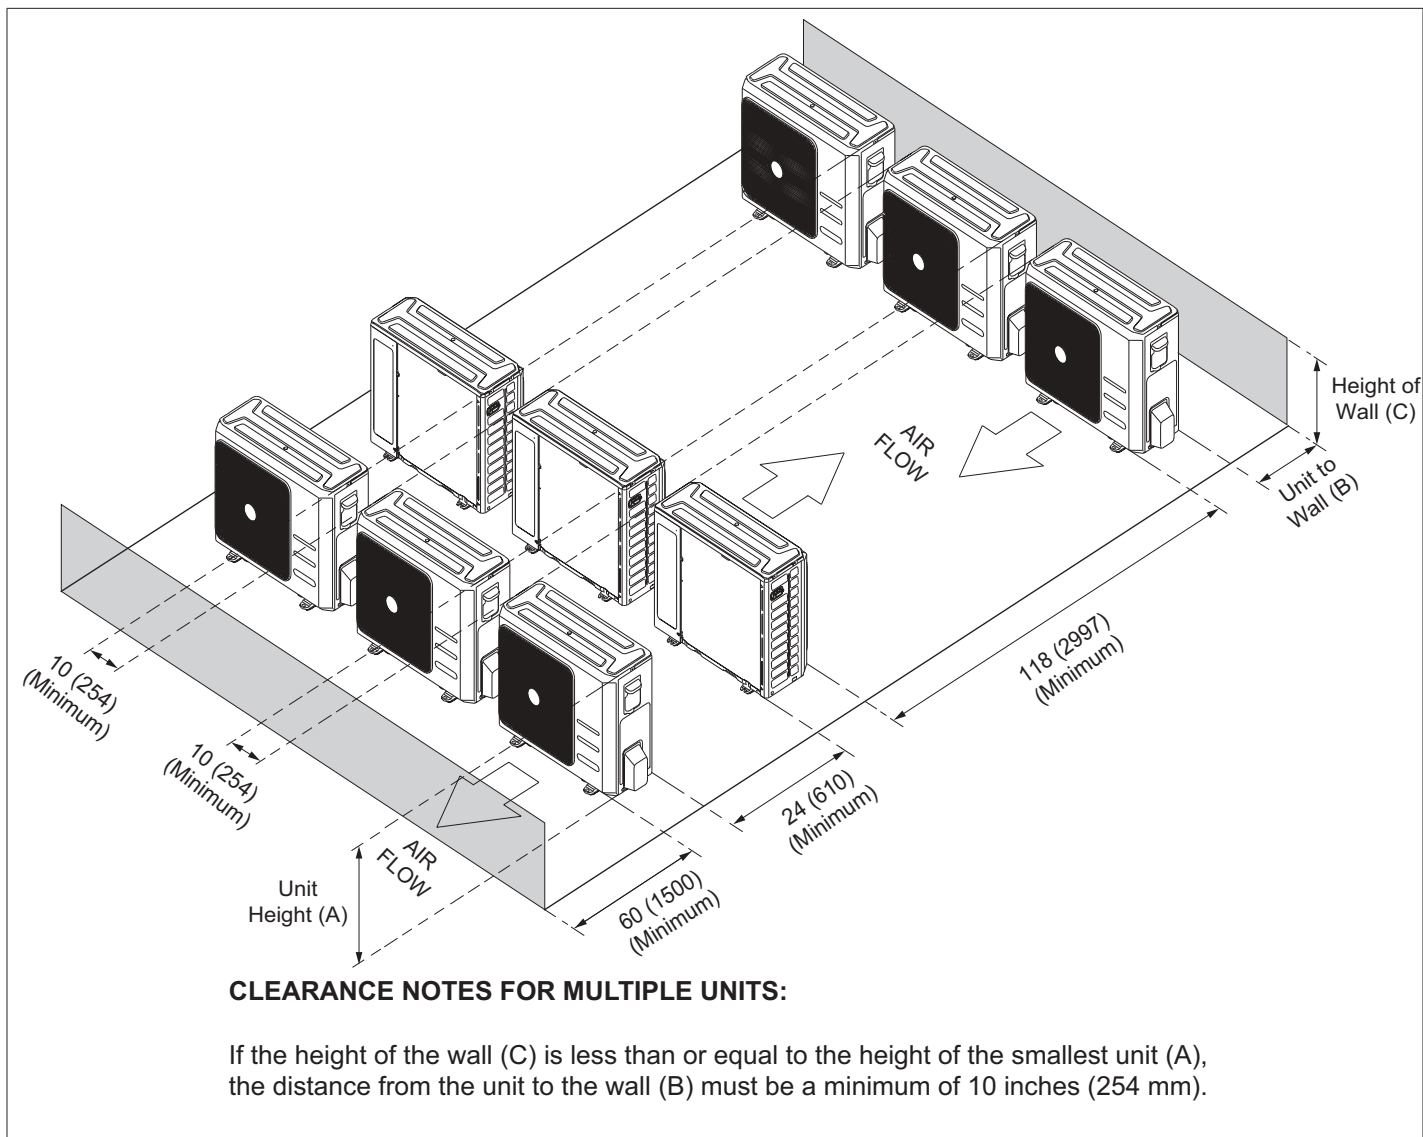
Multiple Outdoor Unit Clearances - Inches (mm)
